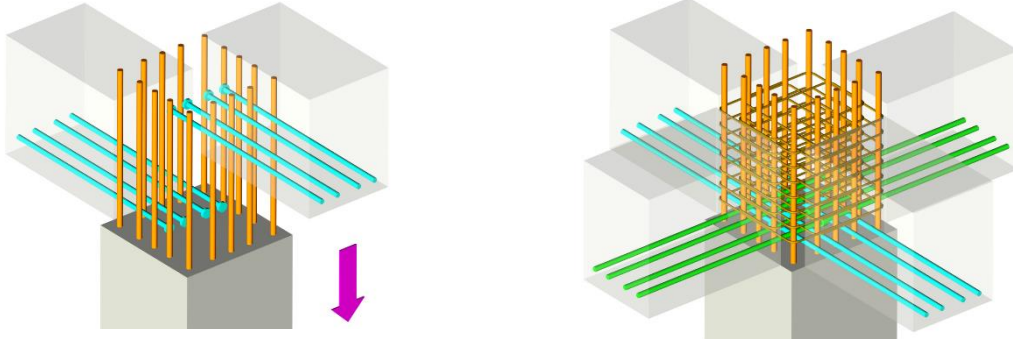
Proposed alternative reinforcing details for connecting precast beams at a cast-in-place joint.
